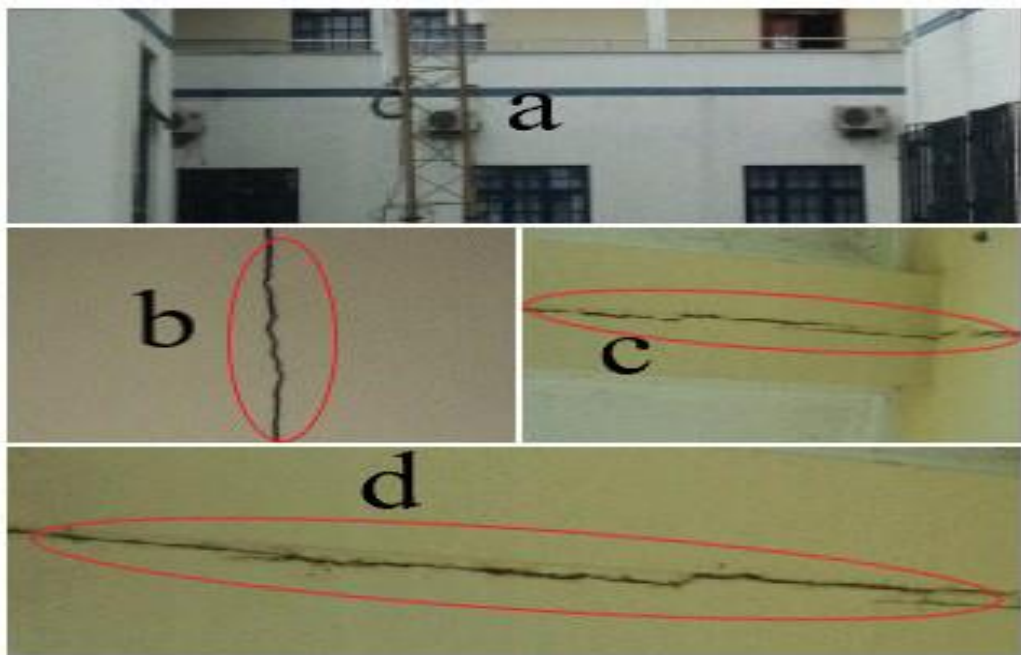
College of Science Building, showing the severity of vertical and horizontal cracks on parts of the building (a) part of the building under study (b) some vertical crack (c) and (d) some horizontal cracks.
